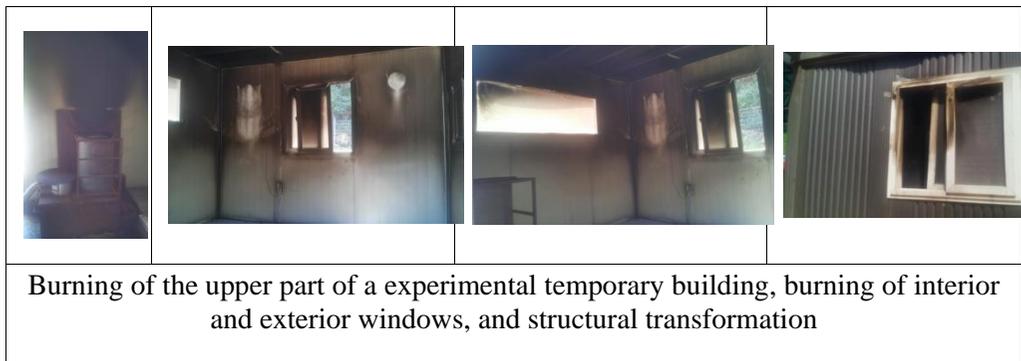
Burning inside and outside of temporary buildings at the fire site and structural deformation
